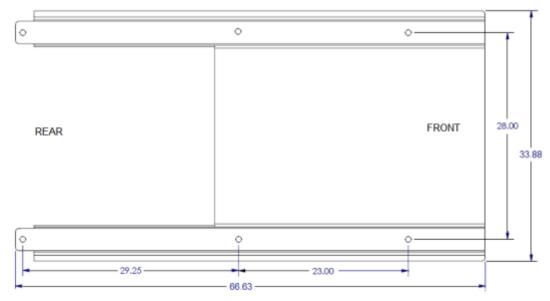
BMK4000-5000N Anchor Bolt Locations
